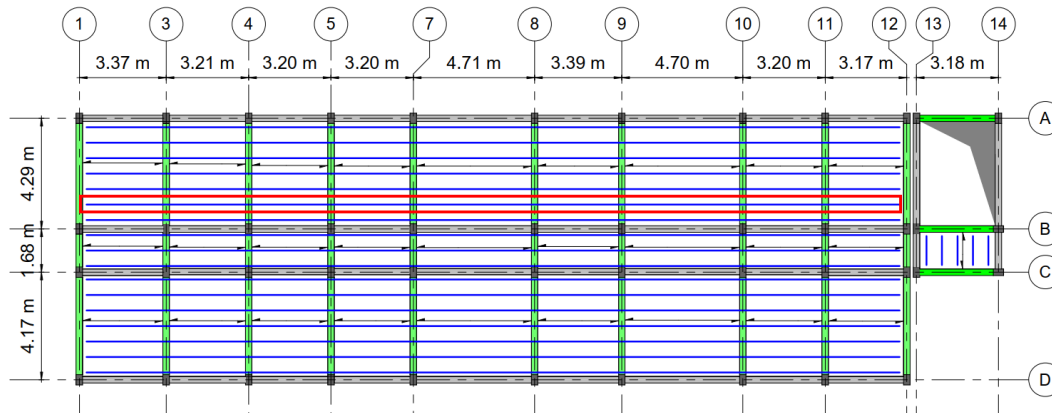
29. Longitudinal ribs on the ribbed slab floor
